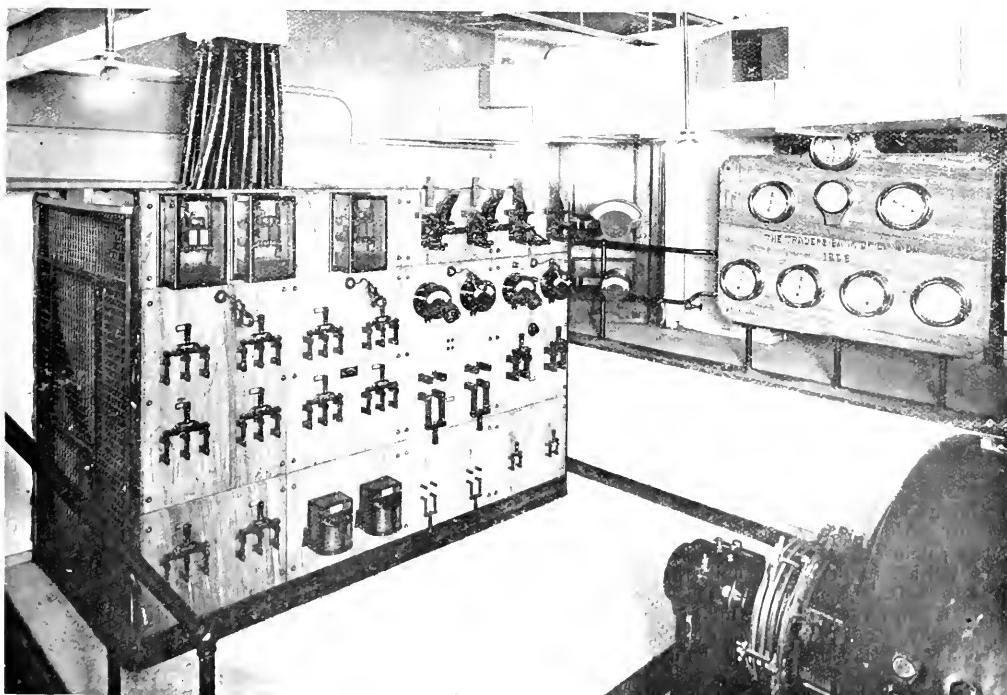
Traders Bank Plant. Main Power and Lighting Switchboard.
